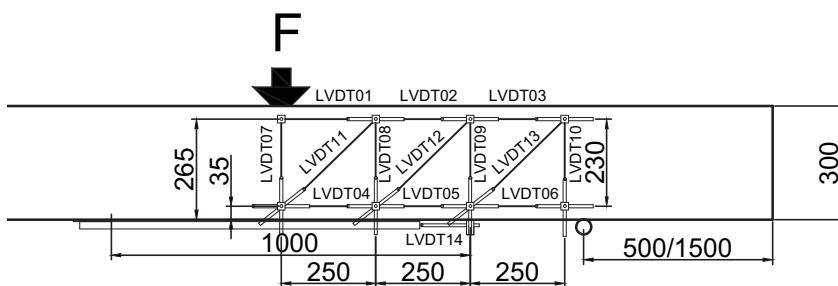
LVDT layout and numbering for 300 mm deep beams
